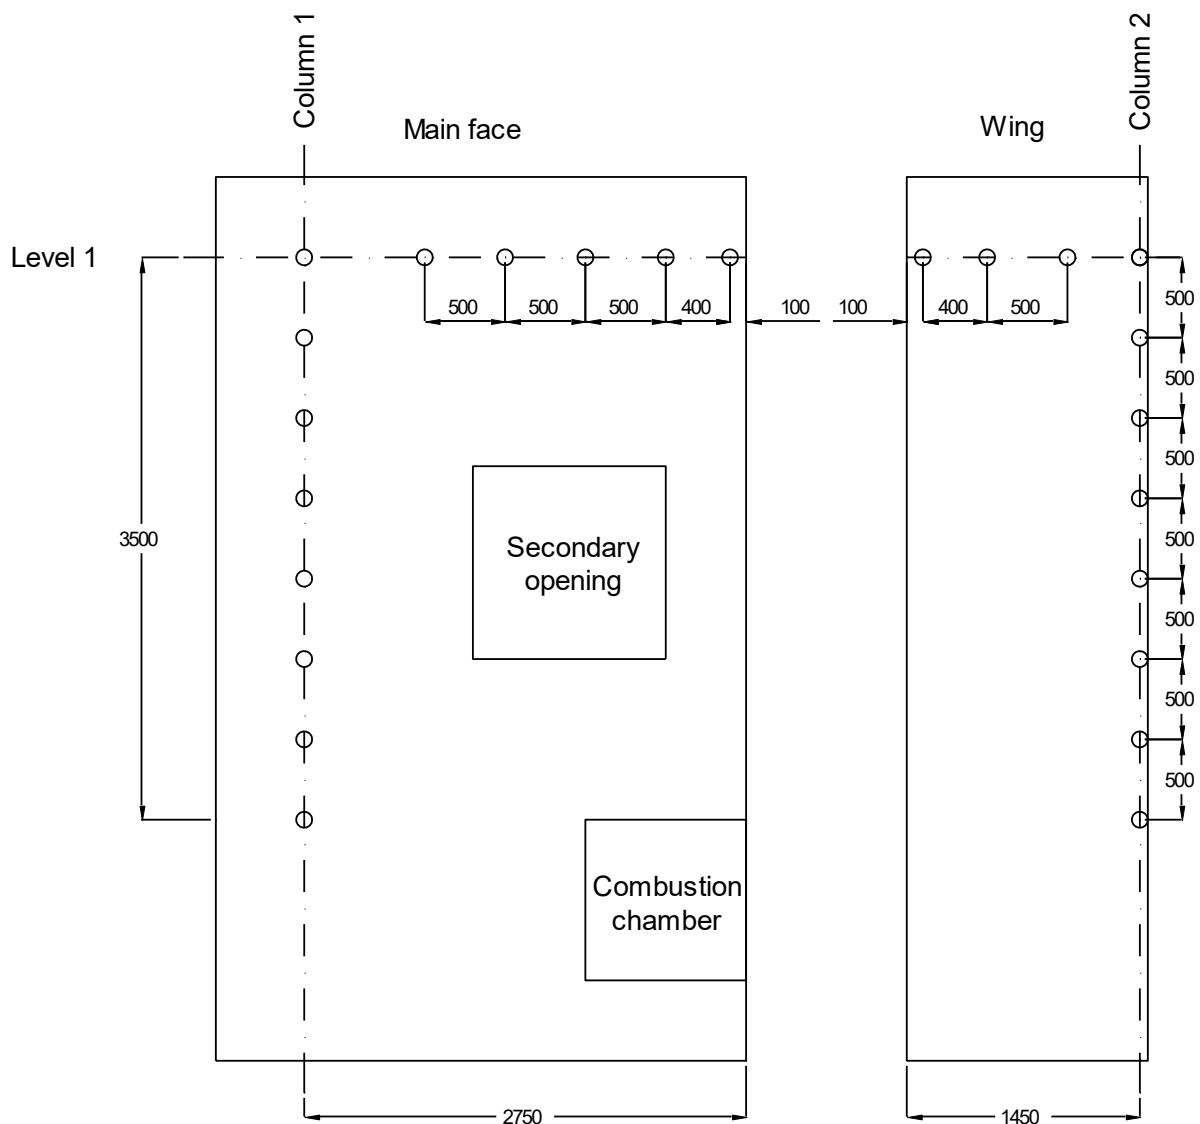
Positions of thermocouples on the exposed face of the tested façade.
